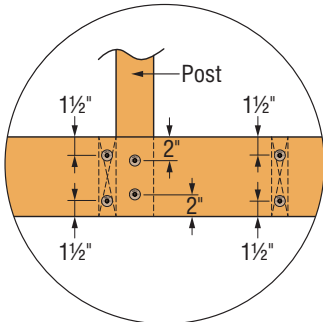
### Detail C — Interior Post on Rim Joist with Adjacent Joist
